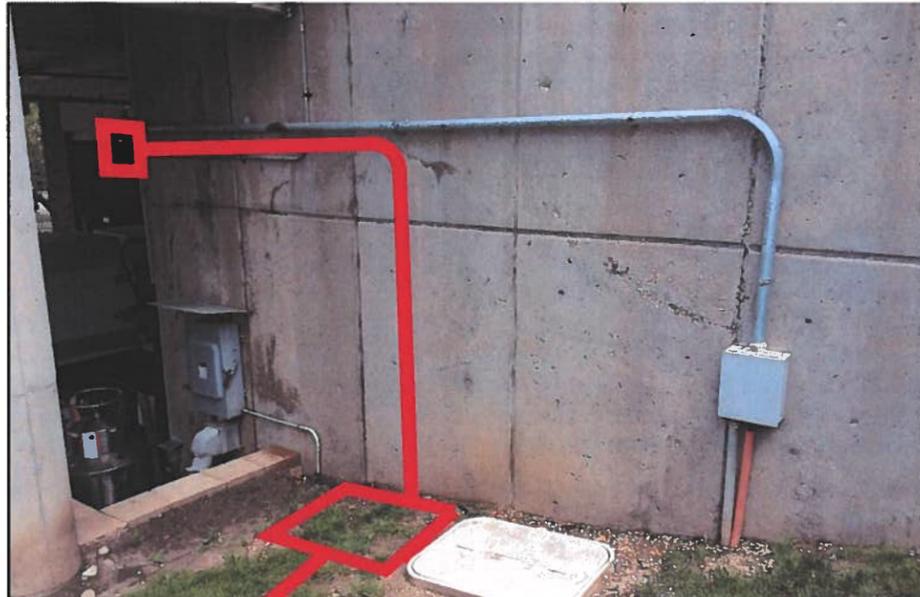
PROPOSED HANDHOLE AT BUILDING, PROPOSED PATH FOR 2" EMT CONDUIT FROM HANDHOLE TO PROPOSED SMALL PULLBOX FOR 90° BEND. (FACING NORTHWEST) - SECTION A-A
